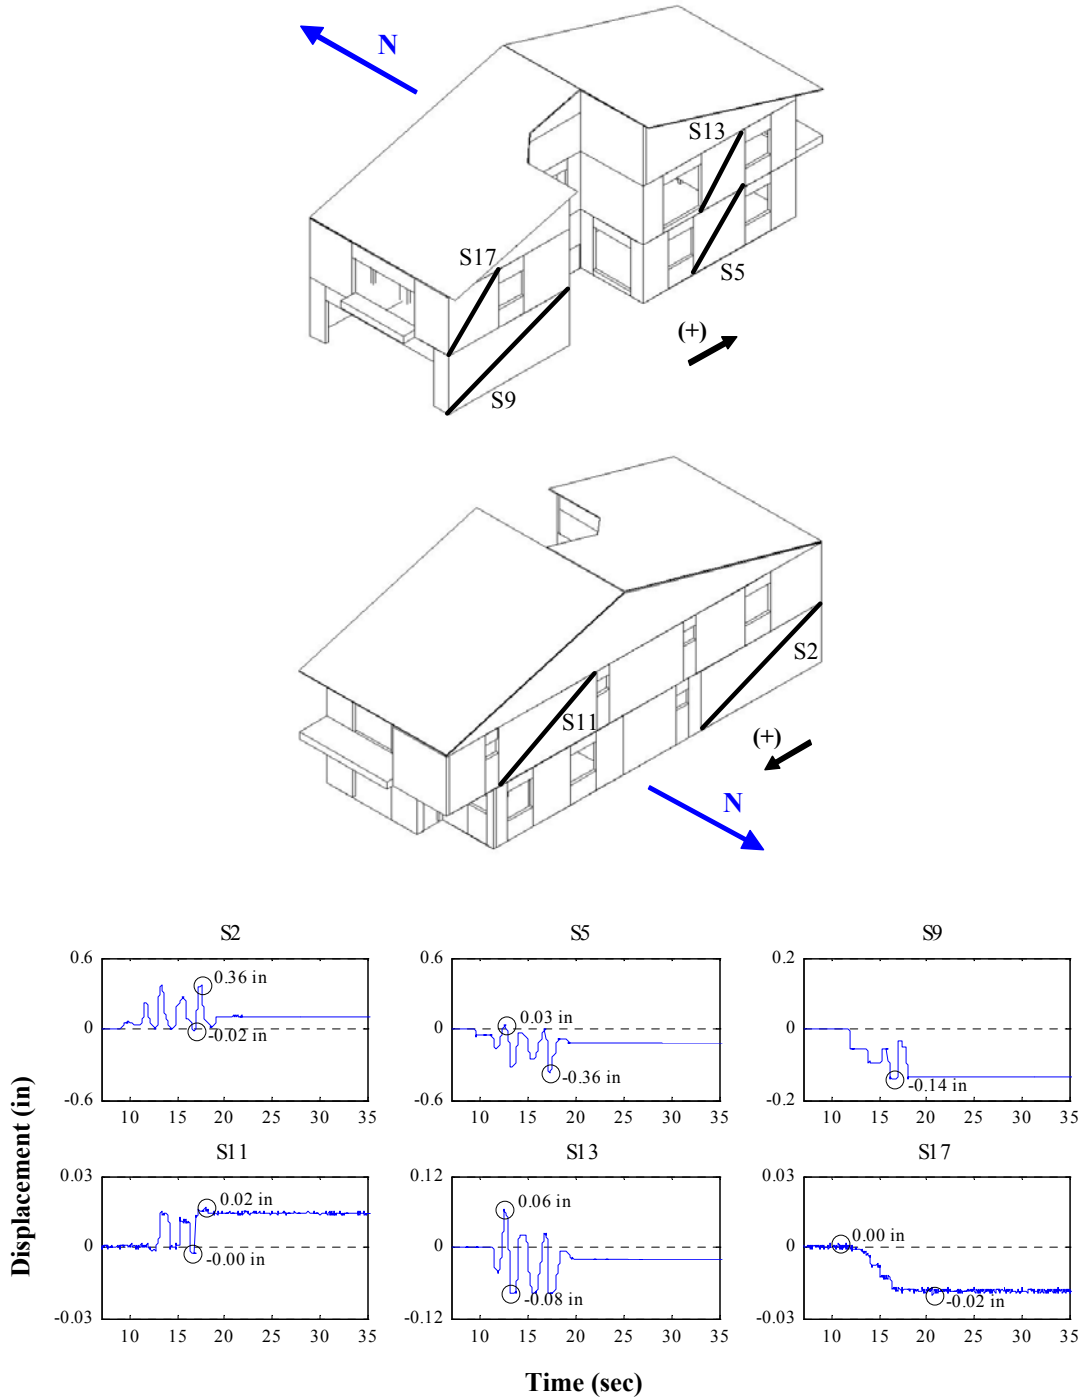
Wall deformations of east-west external walls for Test NWP1S05
